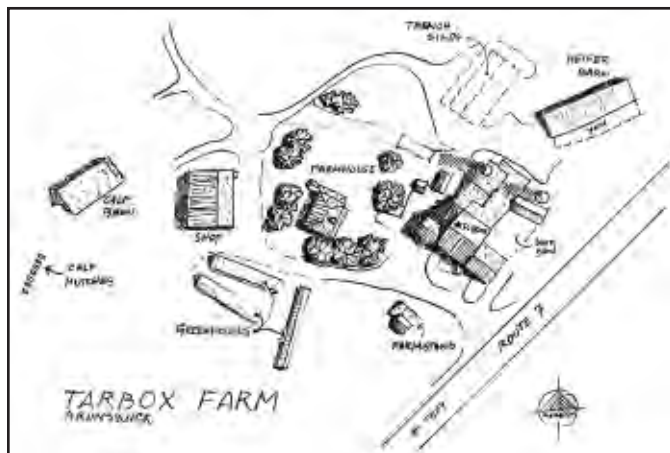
Site plan. The complex of barns, ranging from the eighteenth century Dutch barn to a c.1830 corn crib now used as a part of a roadside farm stand, to several recent greenhouses, built within the last five years (Ned Pratt).
